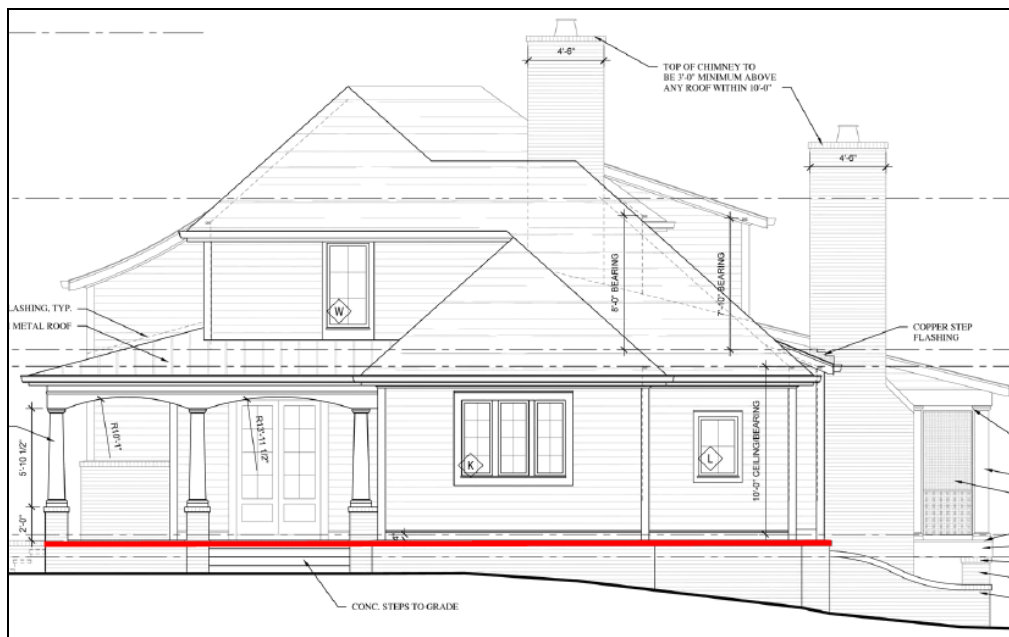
The front/32nd Avenue façade drawing from the preservation permit.
